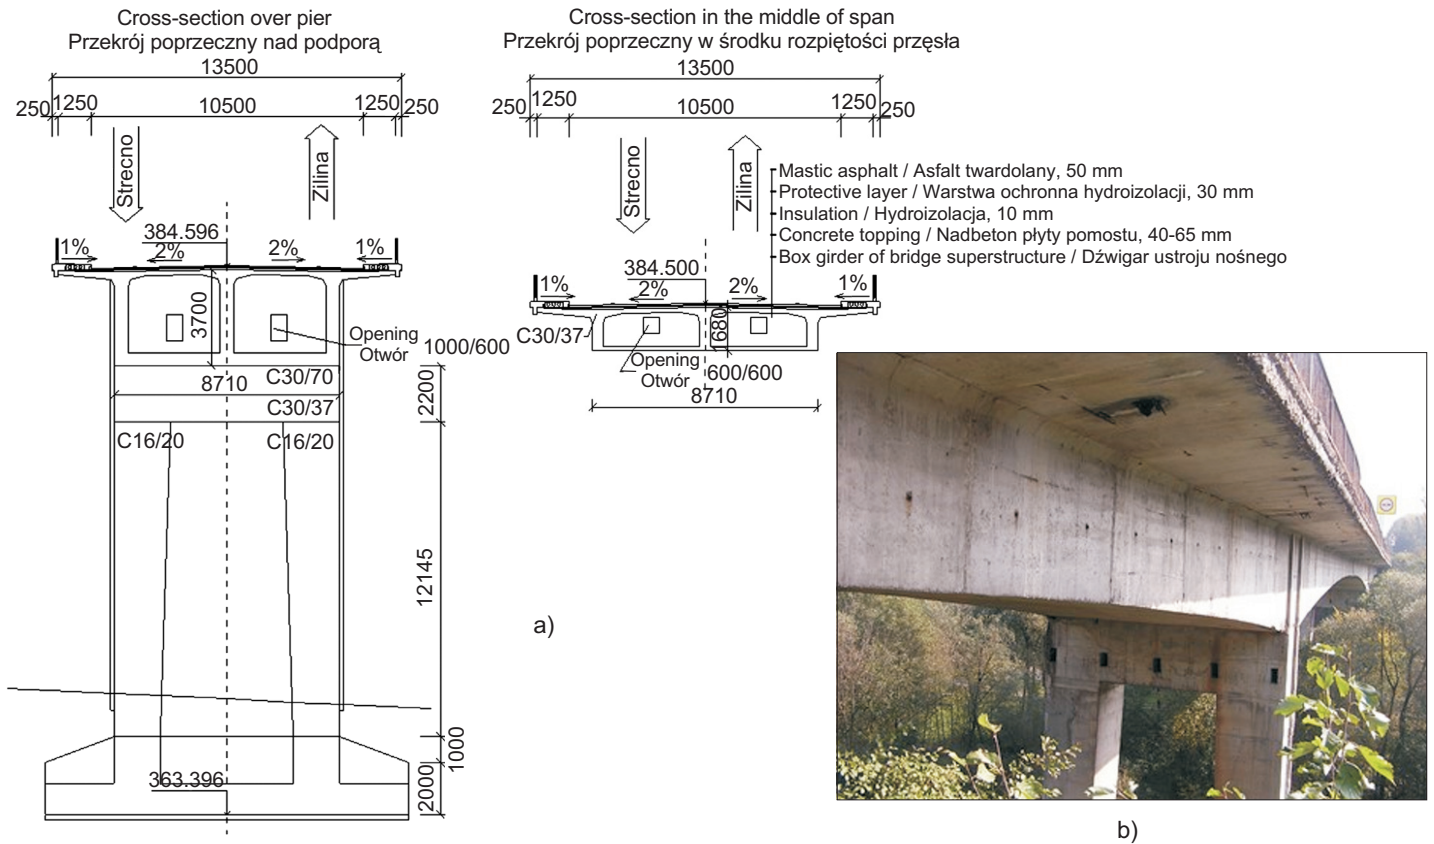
The view of the bridge before the reconstruction: a) cross sections, b) view
